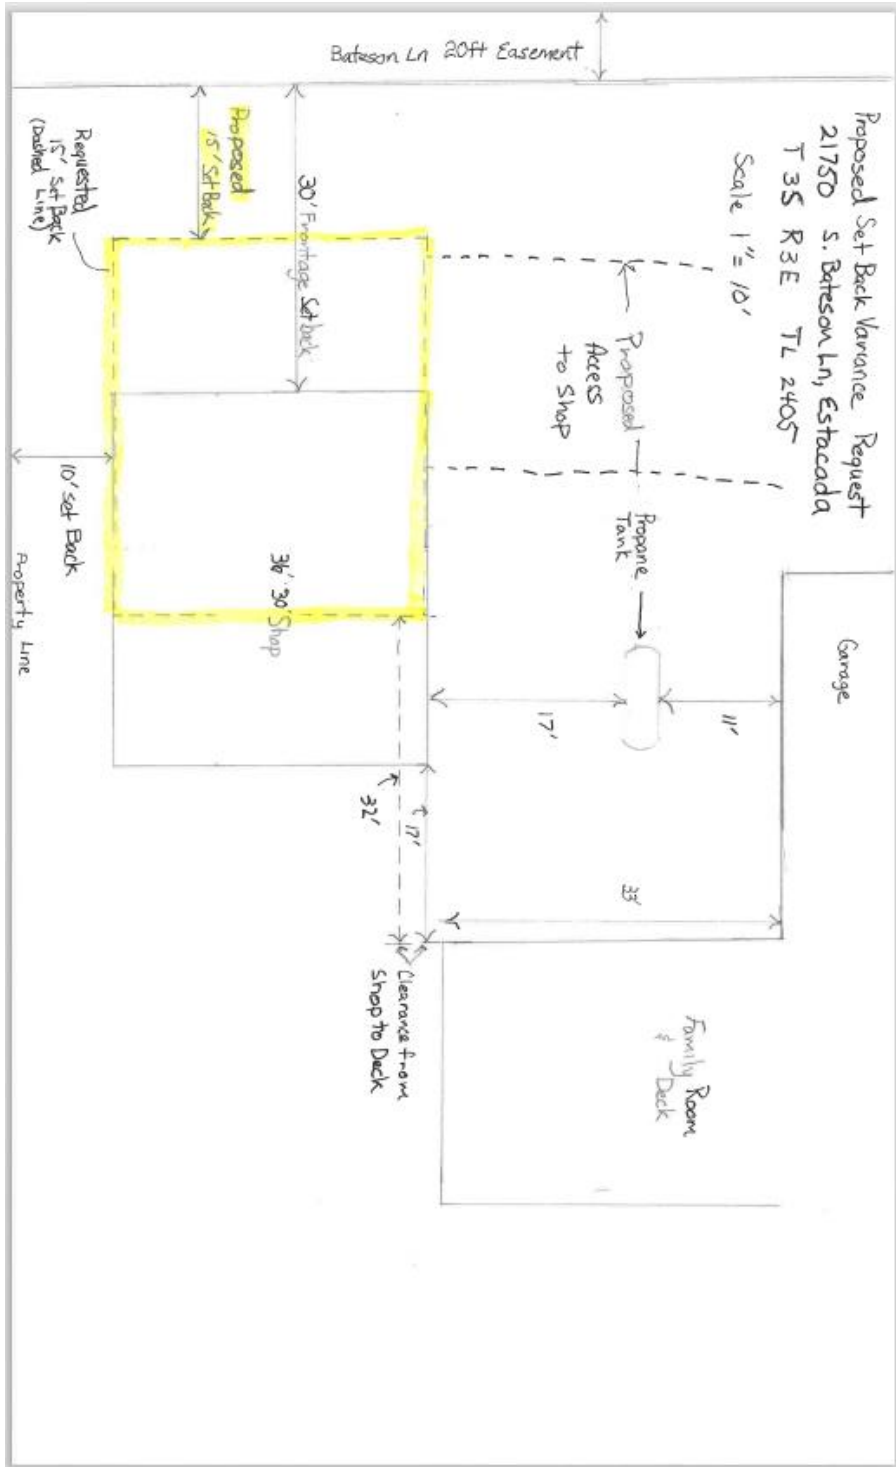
Exhibit F – Applicant's "Close – Up" of Site Plan Location
